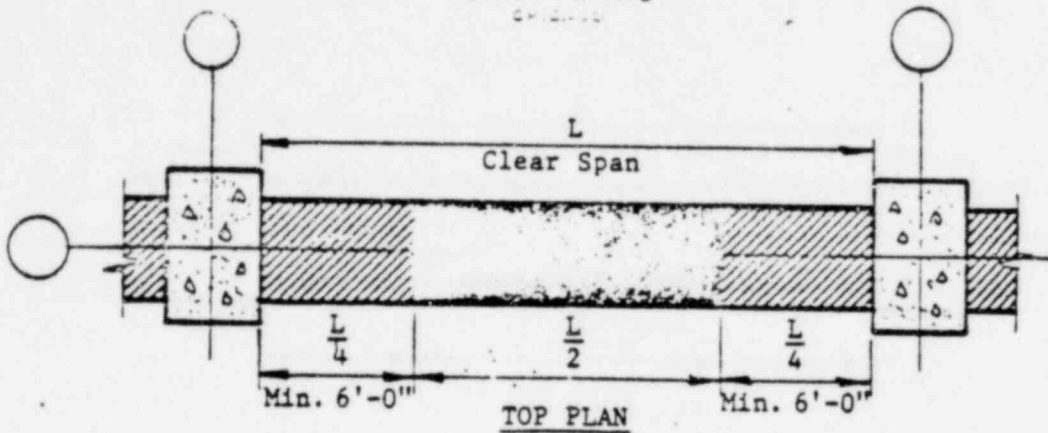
CRITERIA FOR DRILLING OF HOLES FOR EXPANSION ANCHORS IN CONCRETE SLABS
